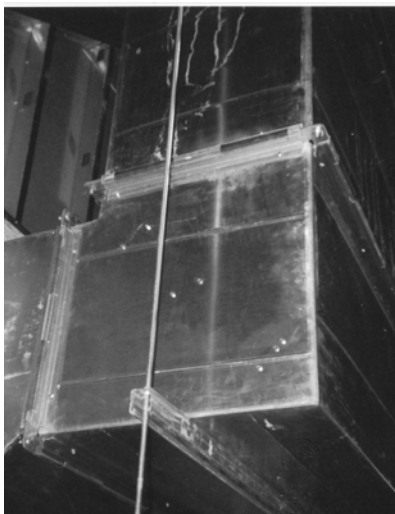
Check of large duct elbow verifying screw attachment of turning vanes.
